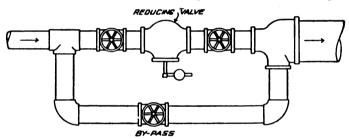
Connections of Reducing Valve in Exhaust-Steam Heating System.
